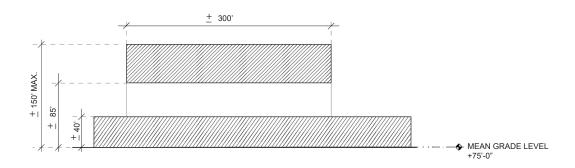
BUILDING HEIGHTS - RETAIL SITE B
